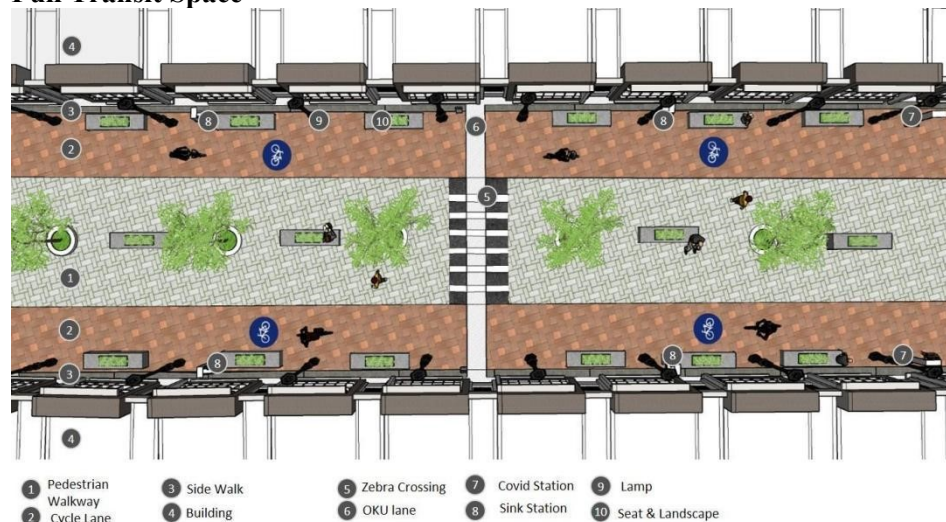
Proposed pedestrian walkway (Full Transit Space)
